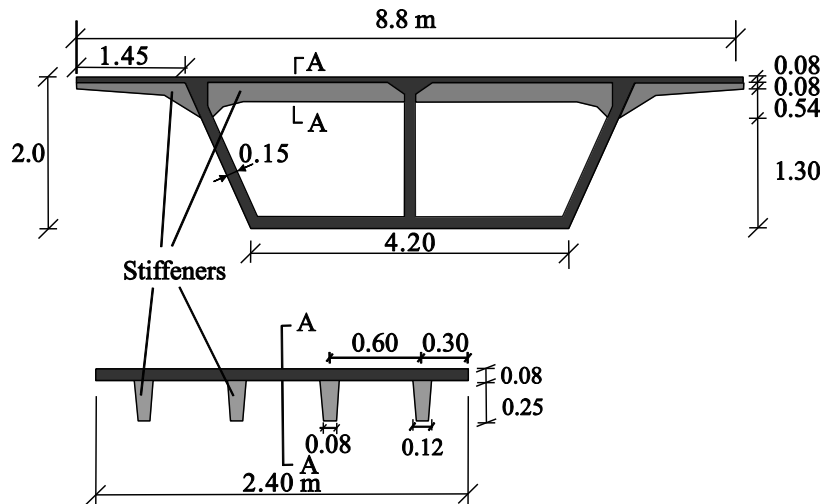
Proposed two-cell box girder cross-section for UHPC-PSB
